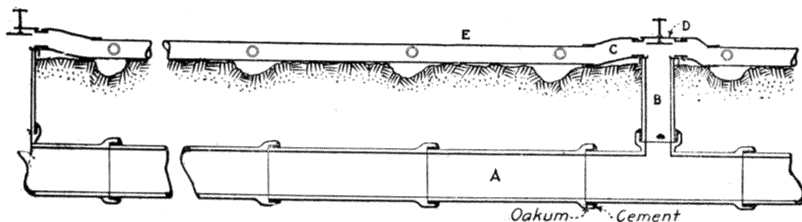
Cross-section of typical terra-cotta pipe system. A shows underground terra-cotta main pipe; B, terra-cotta riser; C, canvas connecting house; D, cast-iron valve; E, distributing pipe
